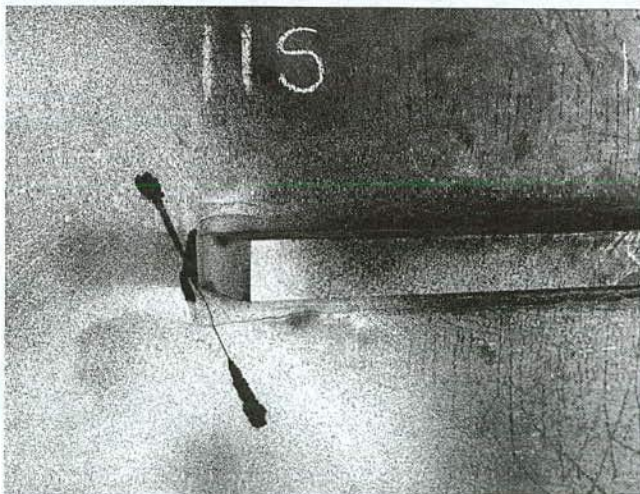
Crack initiated at ground end of gusset plate weld, detail 11, Girder 1S.
